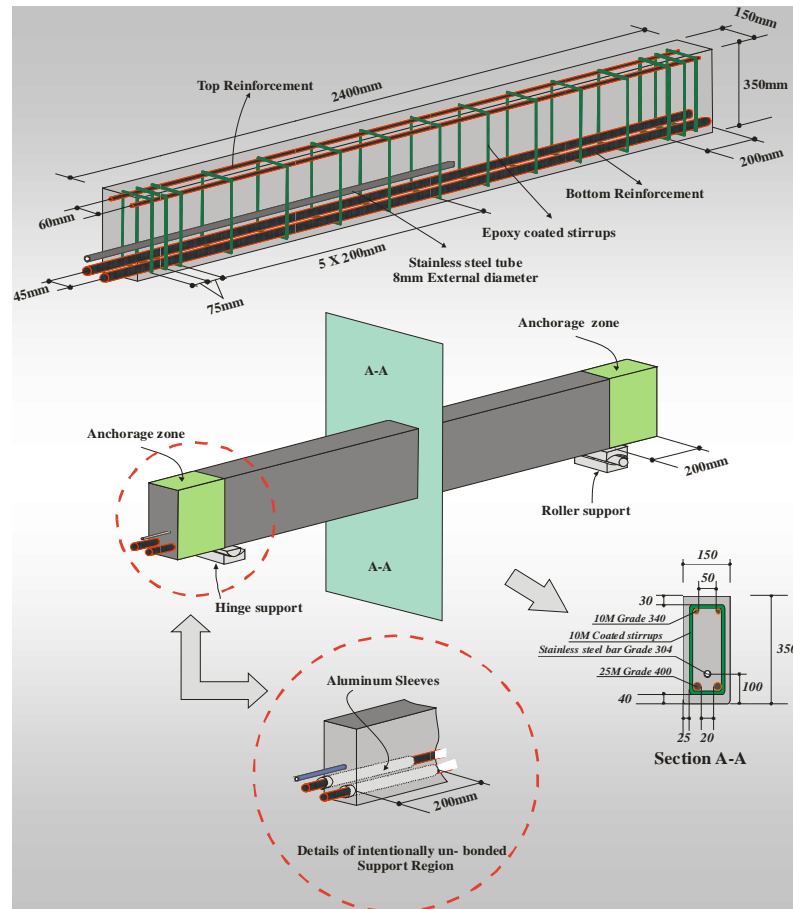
Specimen configuration and reinforcement (all dimensions in millimeters)
